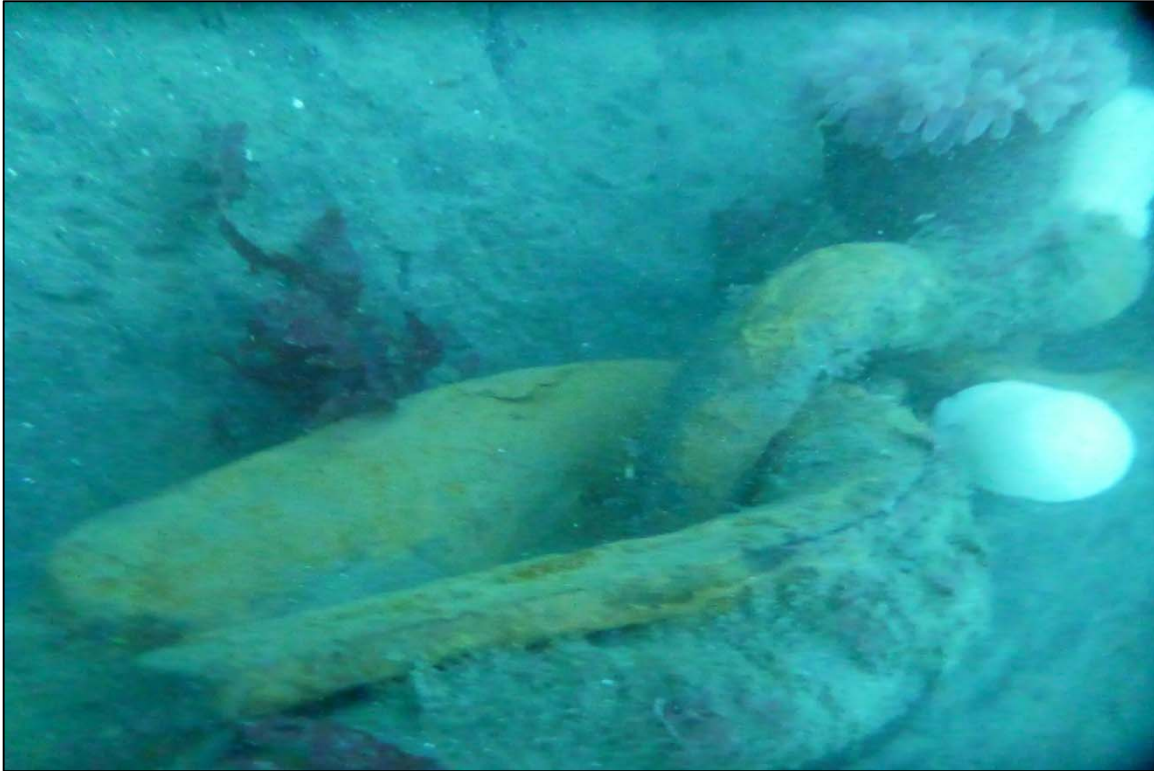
View of Upper Anchor Chain Condition at Site 1 Anchor Line 5, Looking South.
